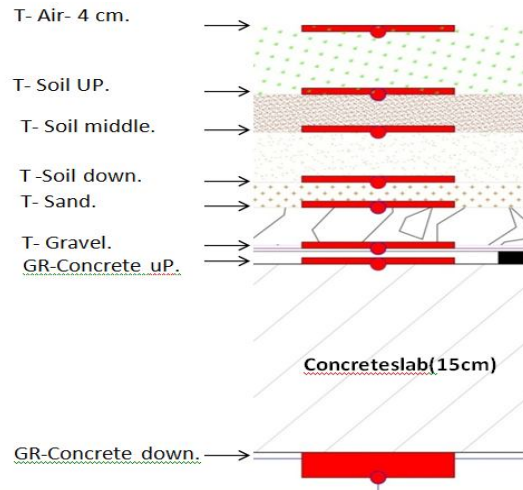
The vertical section shows the sensors' places in the extensive green roof system.
